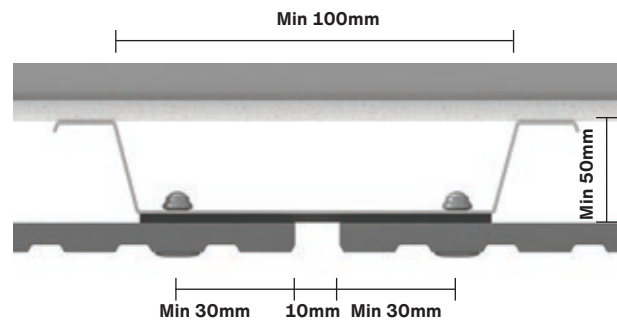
Swisspearl Patina Inline installation on profile behind joint.
